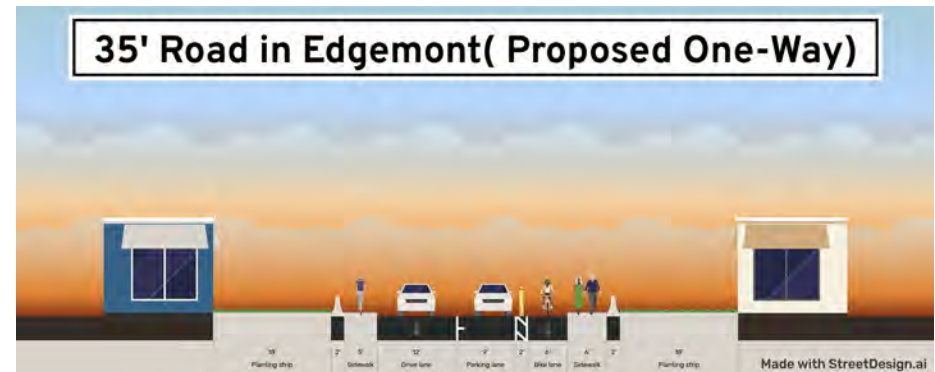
shows that a 35' street in Edgemont could also be reconfigured into a one-way that includes a parallel on street parking on one side of the road and a 4' sidewalk on one side of the road to help facilitate safer streets.
